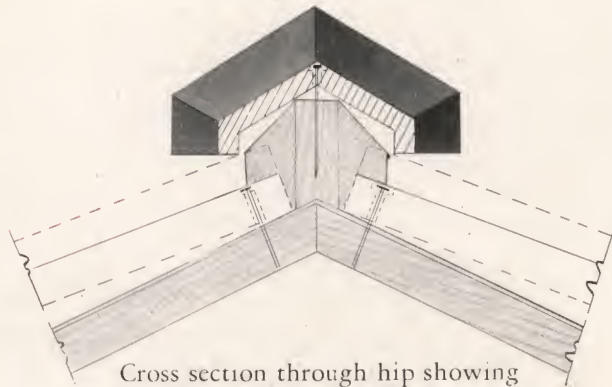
DETAILS OF "IMPERIAL" CLOSED SHINGLE TILE AND FITTINGS
